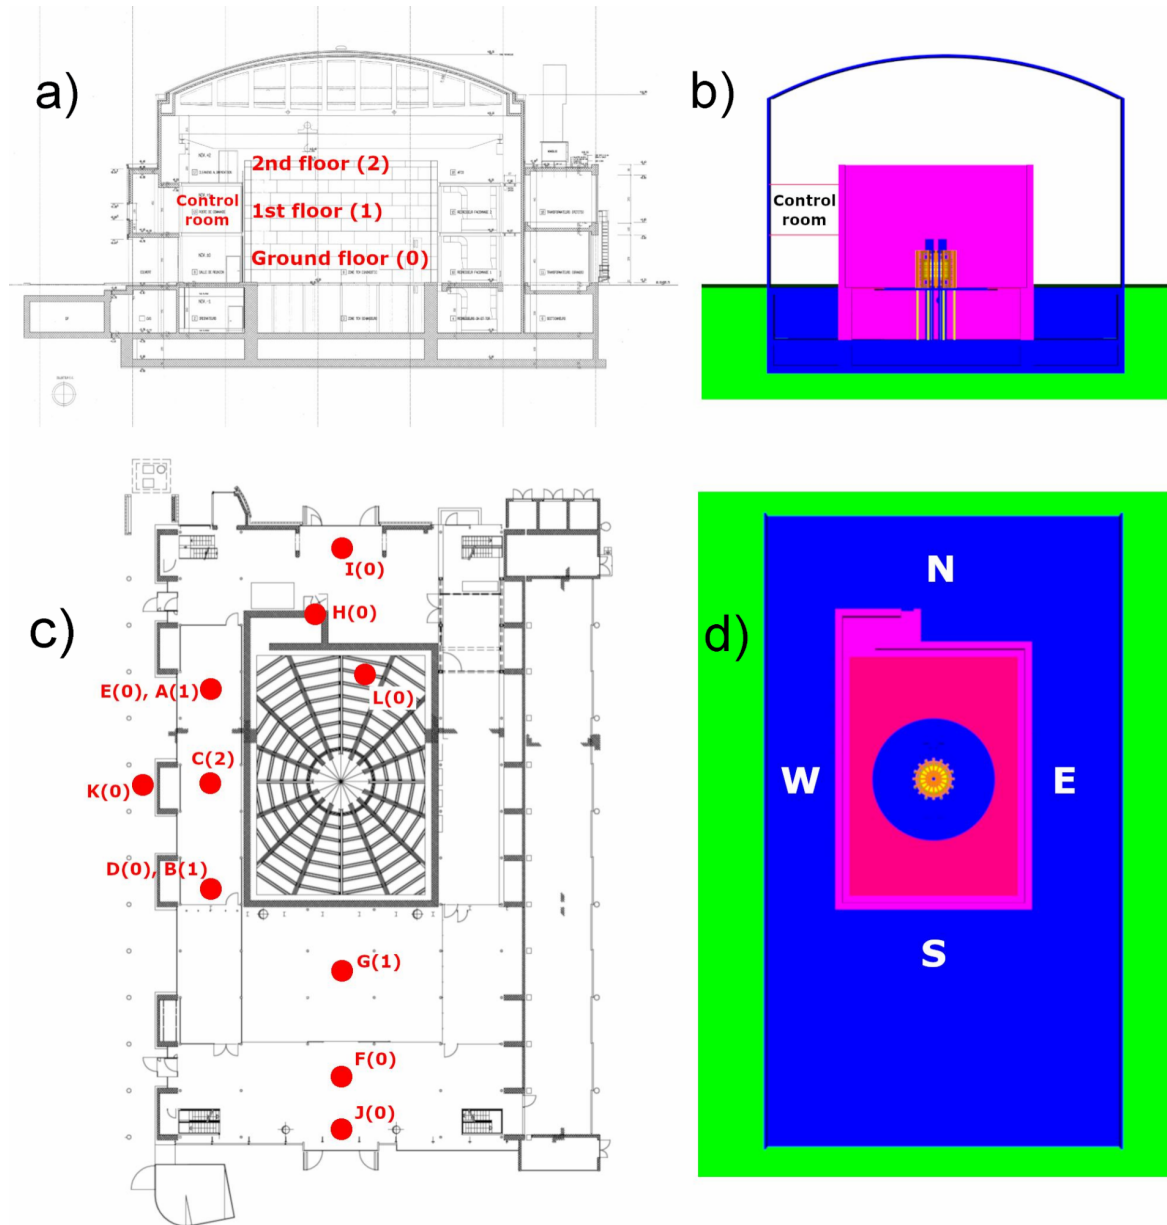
a) East-West engineering cross section of the TCV building in its current conditions. b) East-West cross section of TCV building in MCNP model. c) Horizontal cross section of the TCV building with dose measurement positions (identical with MCNP tally locations). The numbers in brackets indicate the floor levels of the tally locations. The TCV device is at the centre of the TCV hall, on the web-like segmented dismountable ground floor. d) Horizontal cross section of MCNP model.
